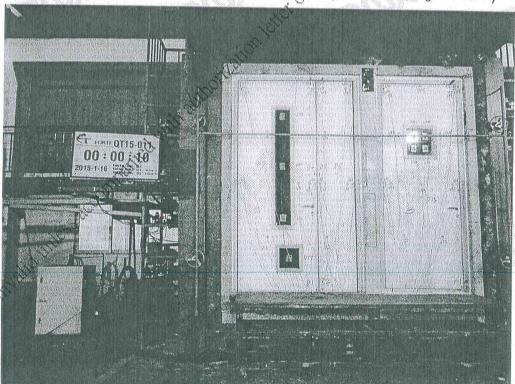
Unexposed surface of the specimen just after the commencement of test. (Left: Door A; Right: Door B)
